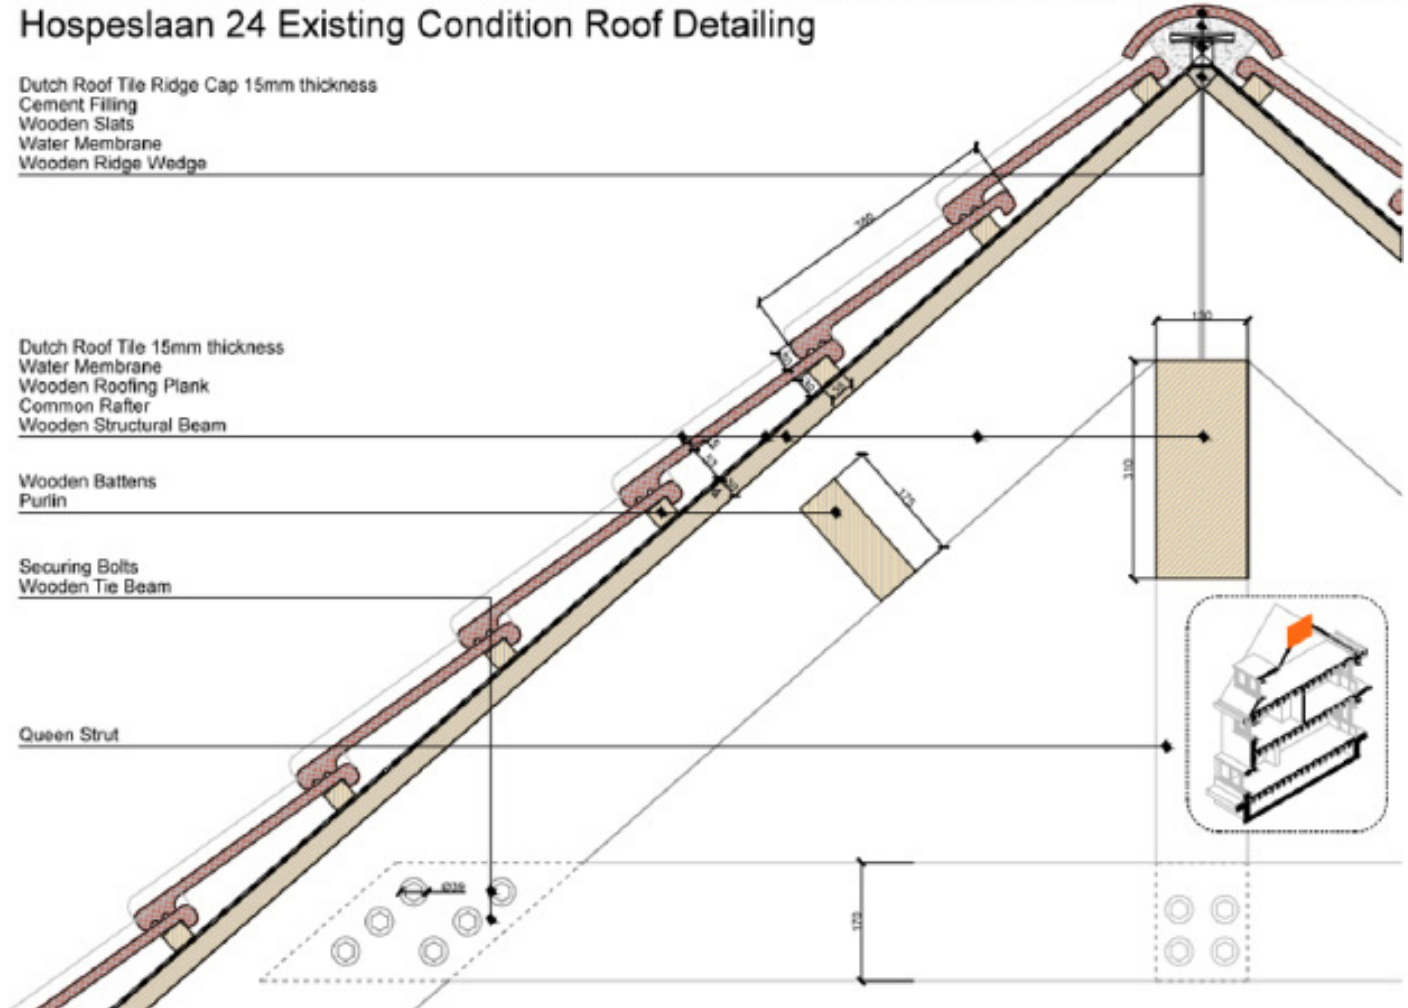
The roof detail of a pre-war rowhouse (source: (Balkuv, 2017))
